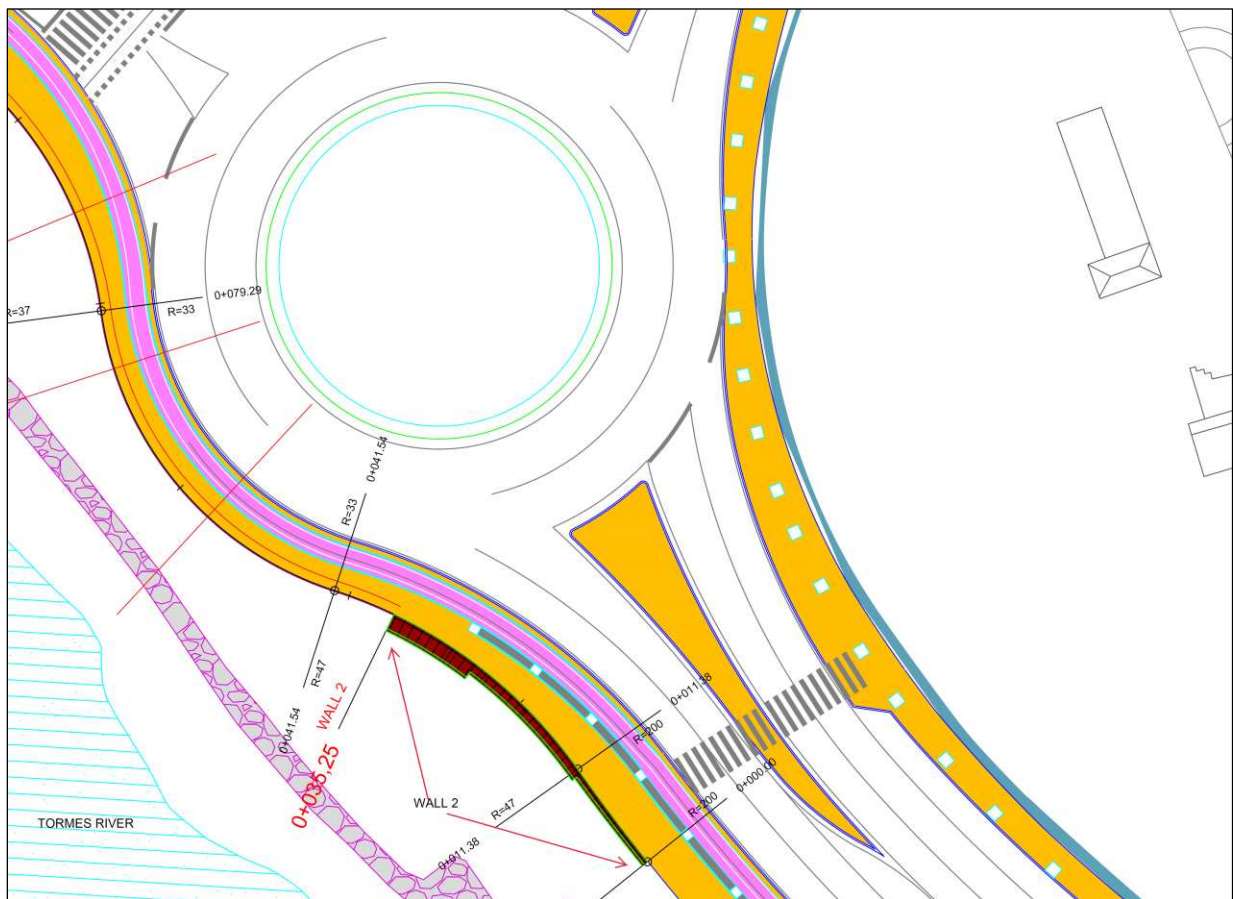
Plan view of Wall 2 (Orbe Técnicas y Medioambiente).
